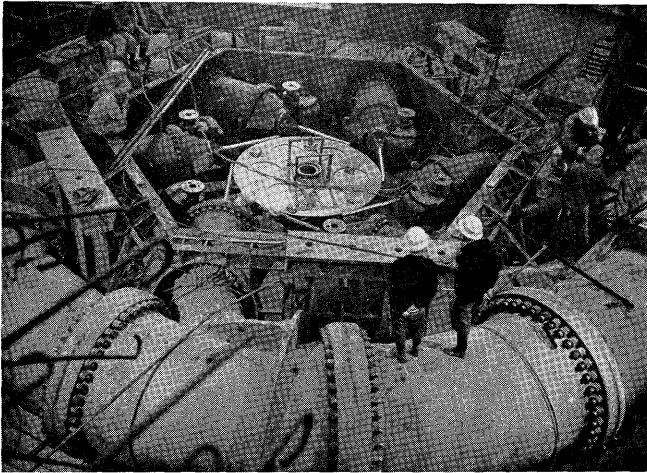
95,800 kw six-nozzle Pelton turbine under installation (Kurobegawa No. 4 Power Station)
